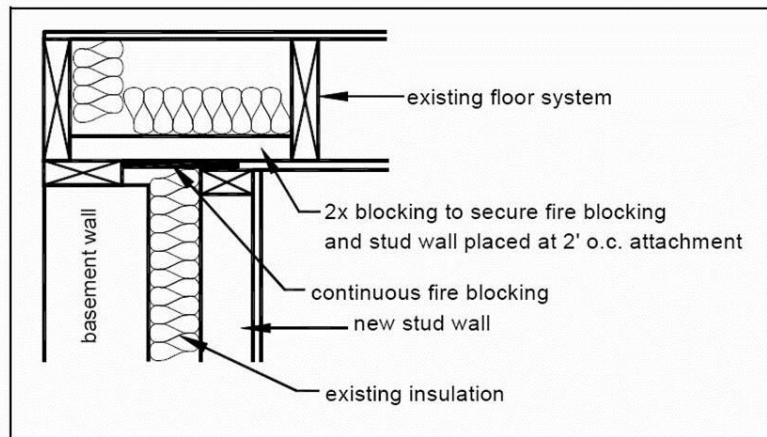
and 6: Stud wall against basement wall & drop ceiling
